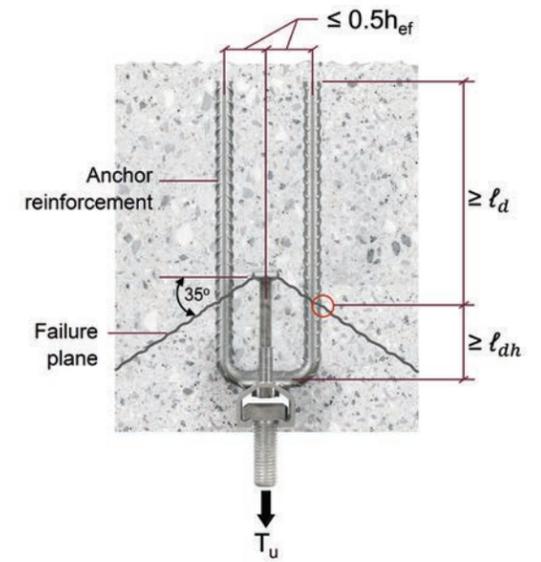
Arrangement of anchor reinforcement for anchor channels loaded in tension, section view.
